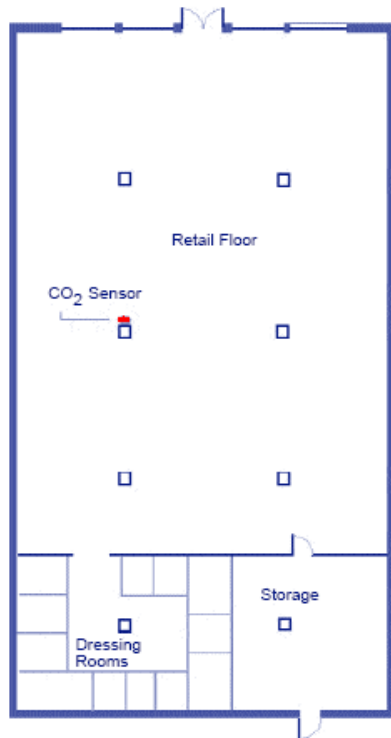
Single zone retail space - retail clothing store /12, p.29/
